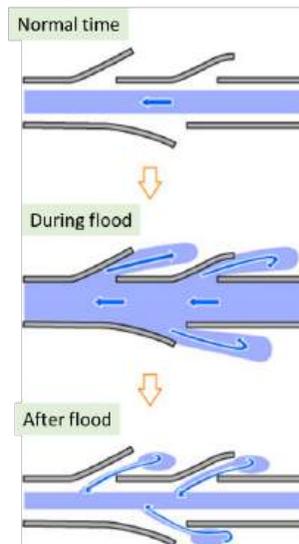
Typical layout plan and function of a non-continuous dike or Kasumi Dike [6]
